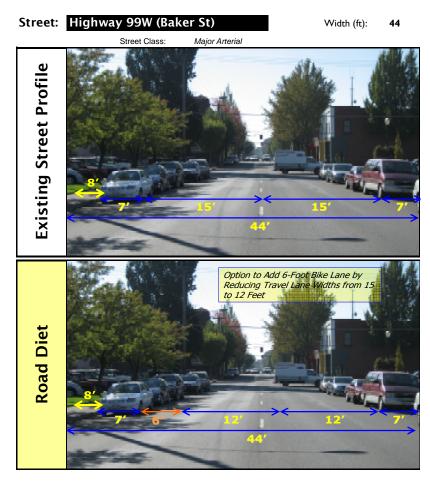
illustrates another Road Diet application, in this example on Highway 99W (Baker Street) within the one-way couplet section. By reducing travel lanes from 15 to 12 feet, a new 6-foot bike lane can be added.
